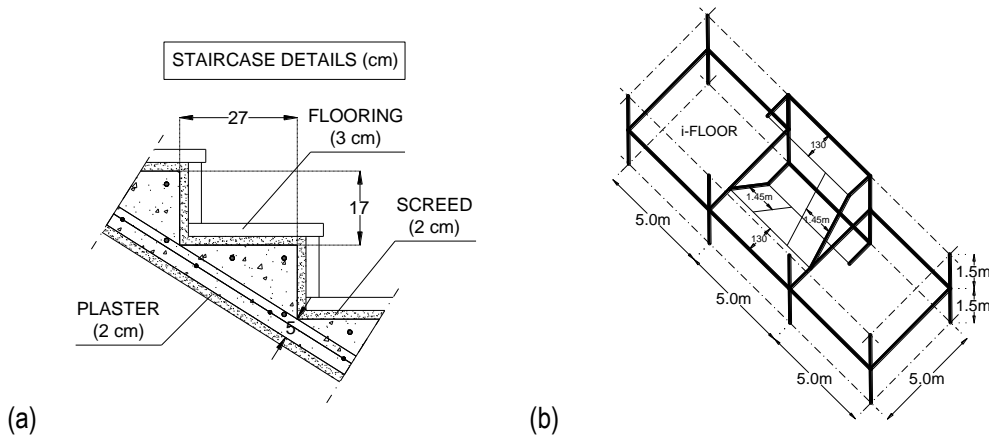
Geometrical details of the benchmark buildings: (a) stair steps and (b) staircase composition.
